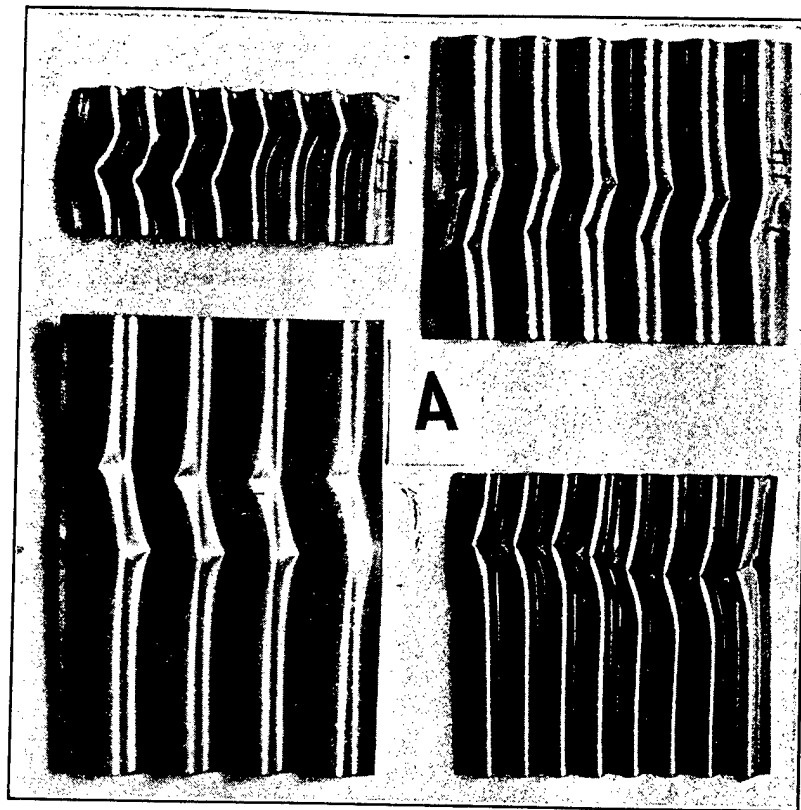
Buckling Failure of Corrugated Sheet.
